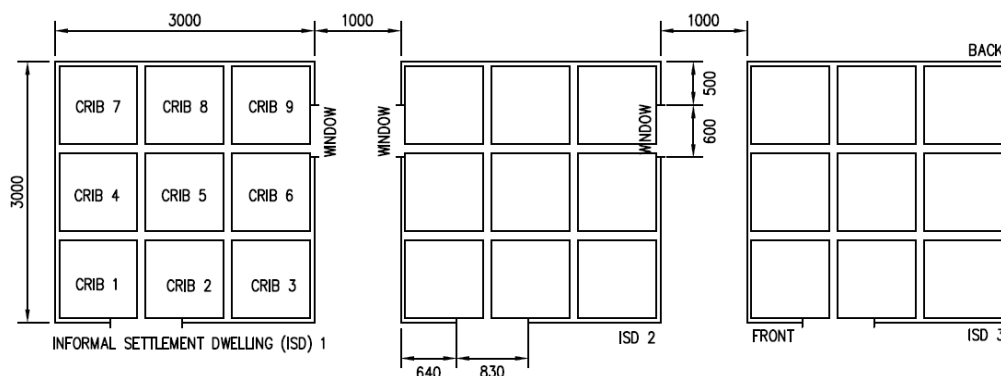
Experimental details showing timber crib layouts, ISD spacing and ventilation details
